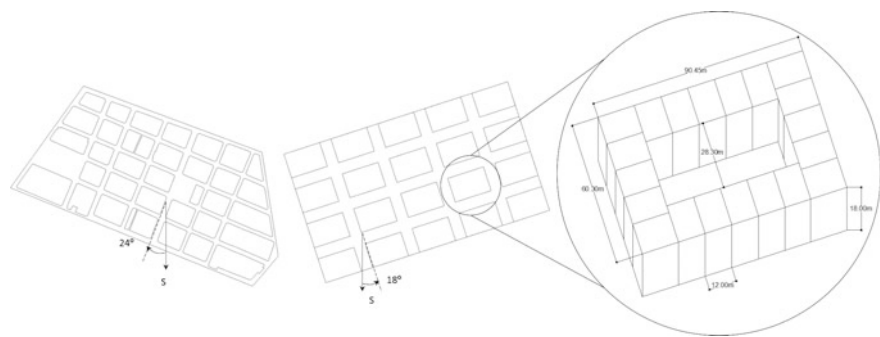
Current neighbourhood planning (left) and new planning proposal (right)
